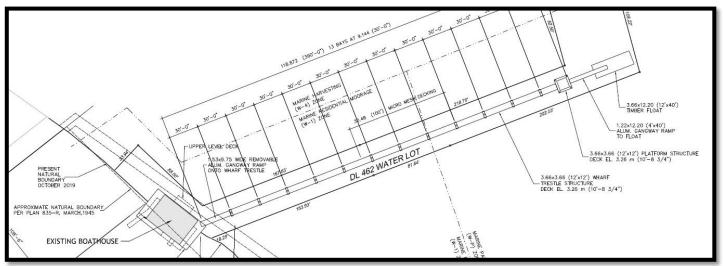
Proposed dock site plan. Full site plan and dock designs can be seen in Attachment B.
